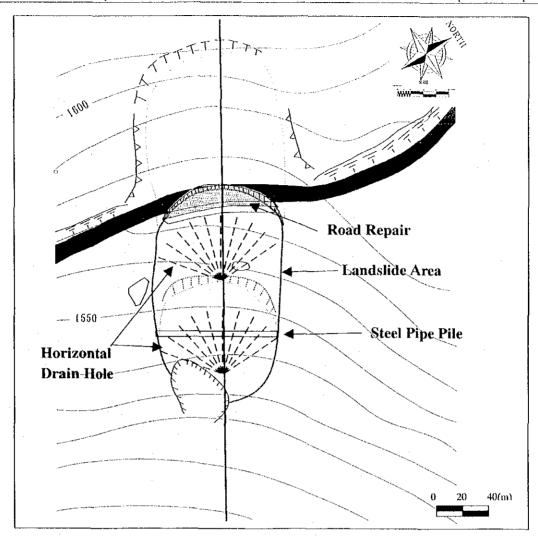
Plan (Steel Pipe Pile and Horizontal Drainage)
